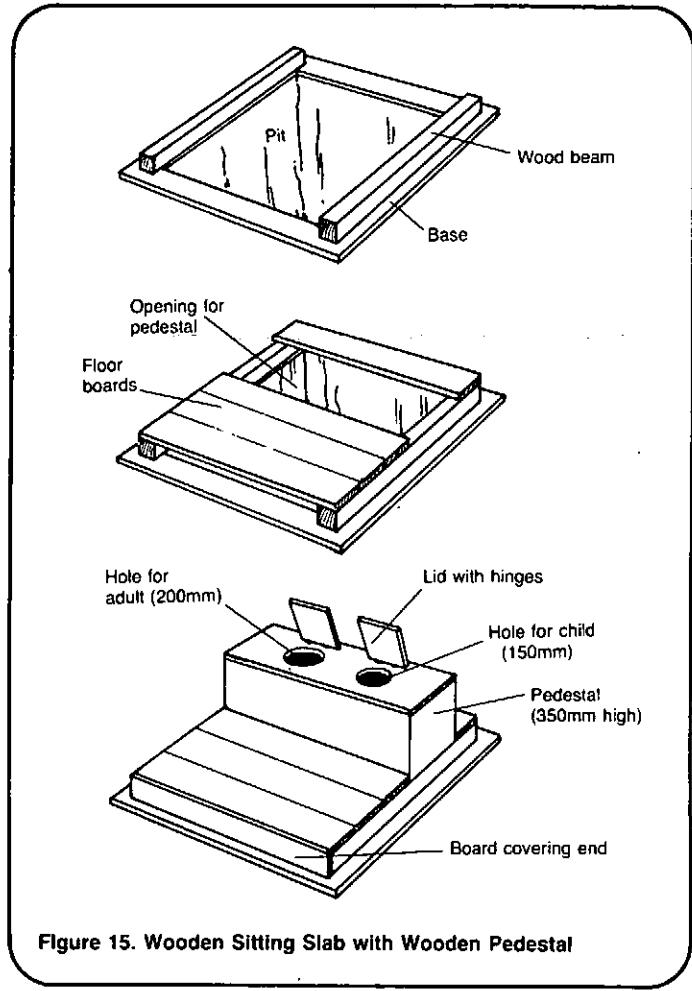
Wooden Sitting Slab with Wooden Pedestal
